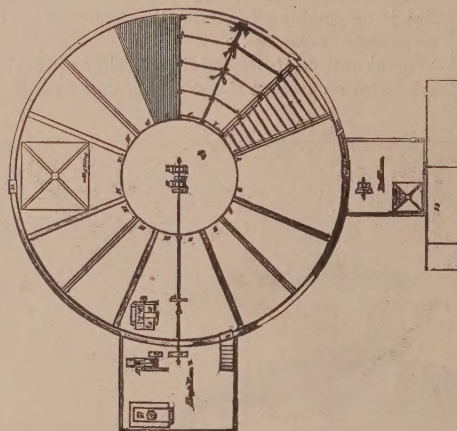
GROUND PLAN OF ROUND ELEVATOR.
